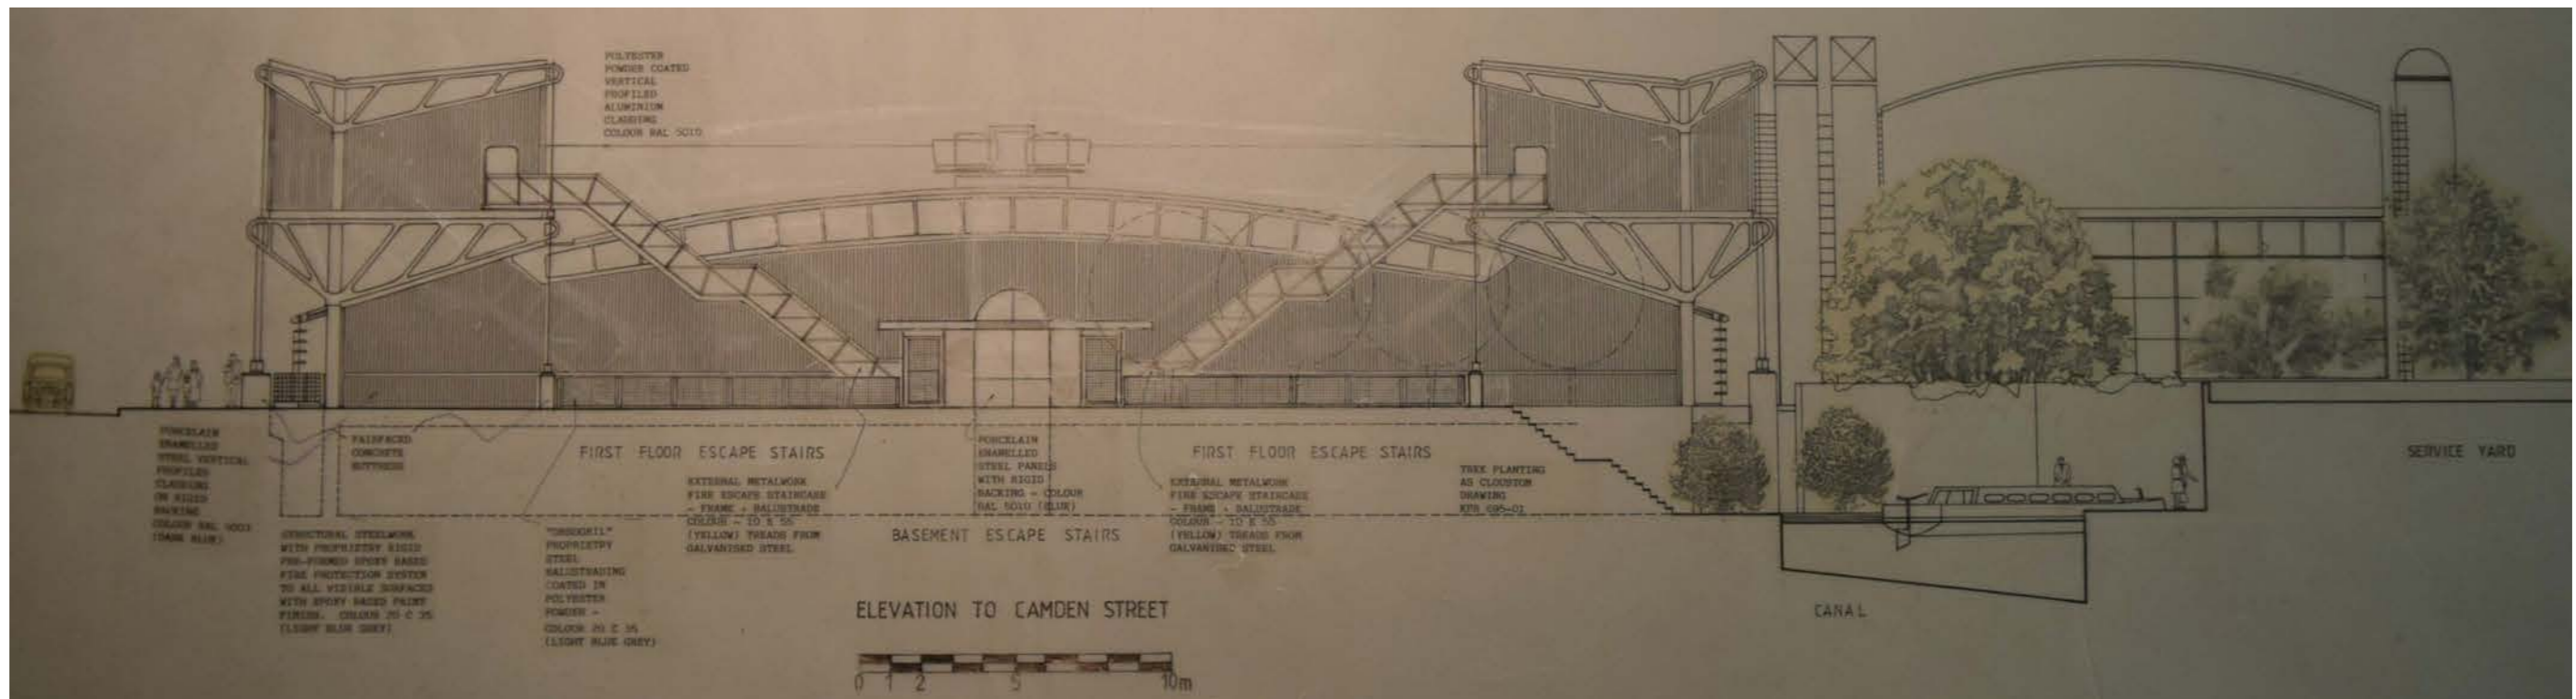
1988: Sainsbury's: Elevation to Camden Street (V&A Collections).
